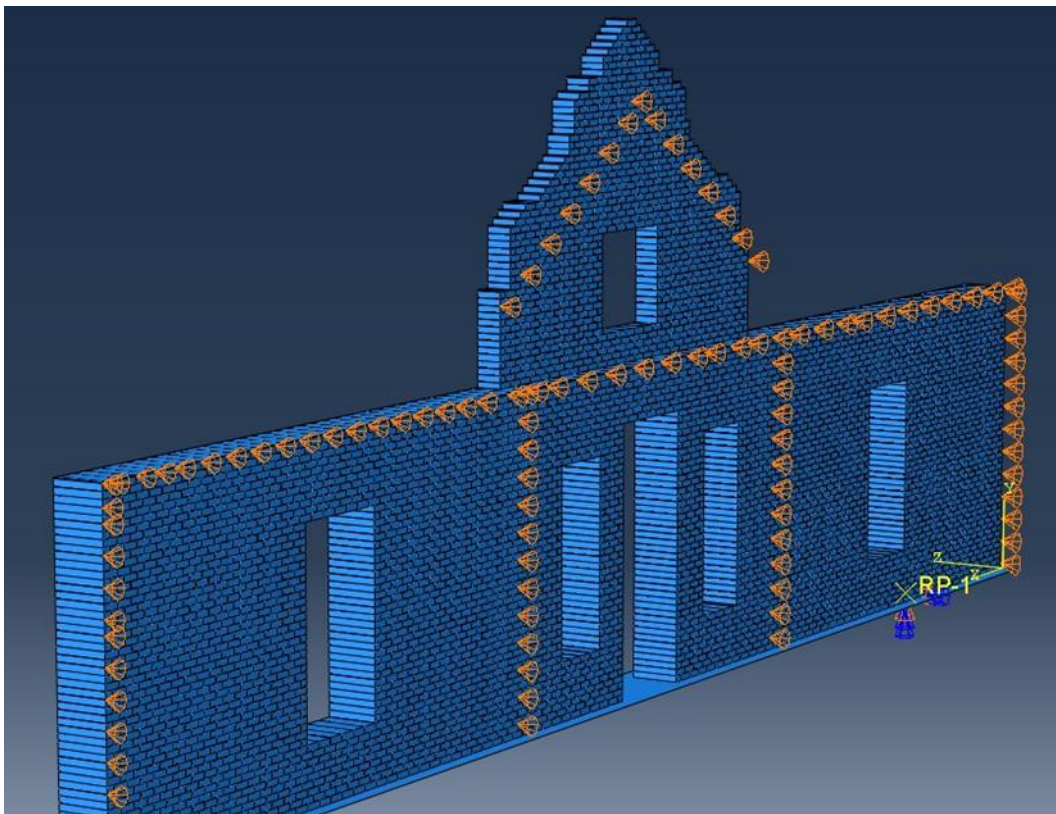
Boundary conditions for the internal bracing on the wall and the gable
